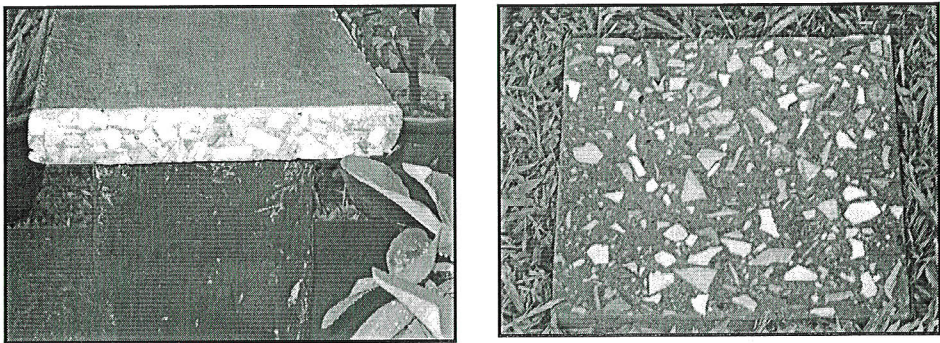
Example of Concrete Ceramic Waste Slab (CCWS).
